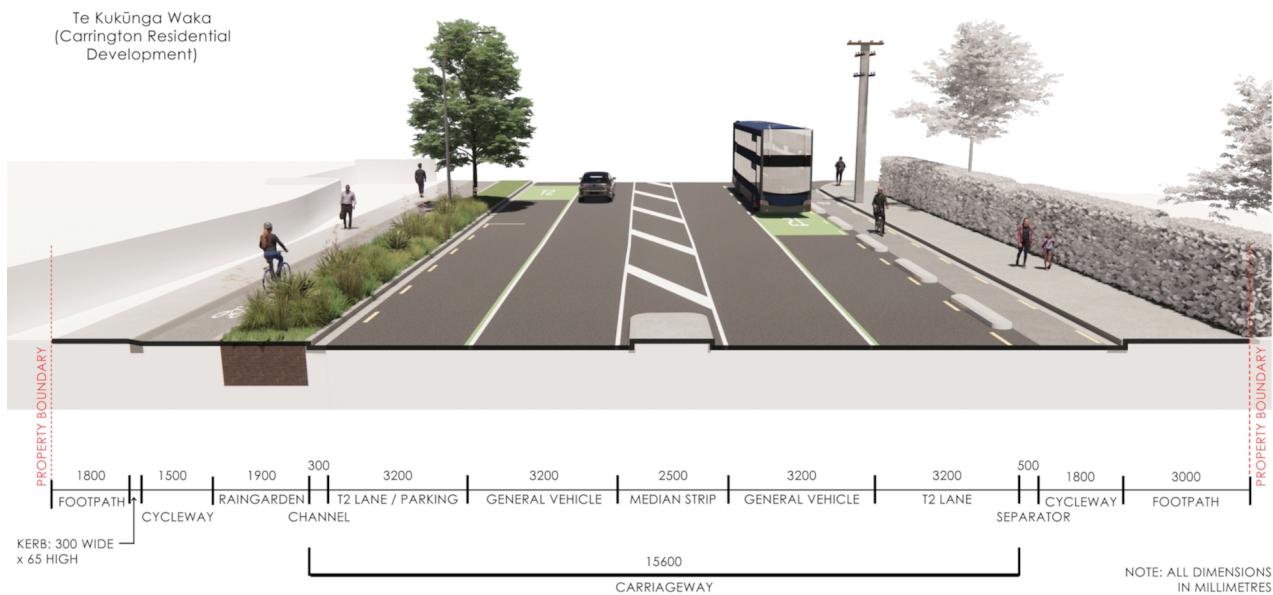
Typical Carrington Road cross-section, north of Woodward Road
